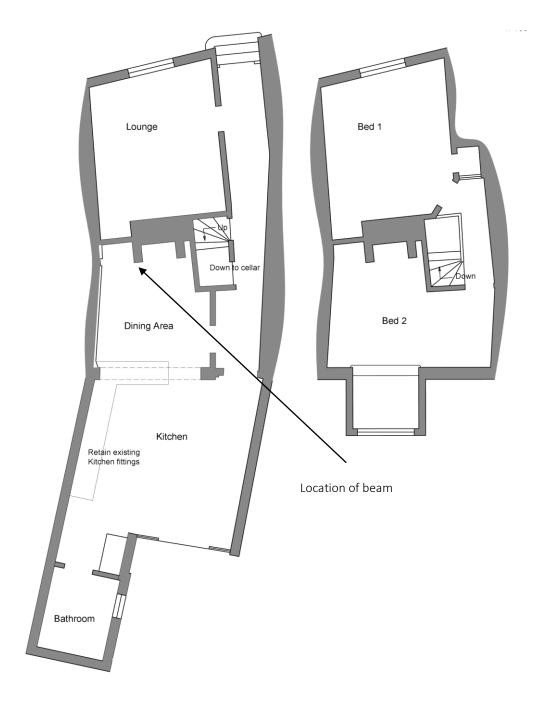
Proposed works (scale 1:100) (Courtesy of A.D. Practice Ltd)
